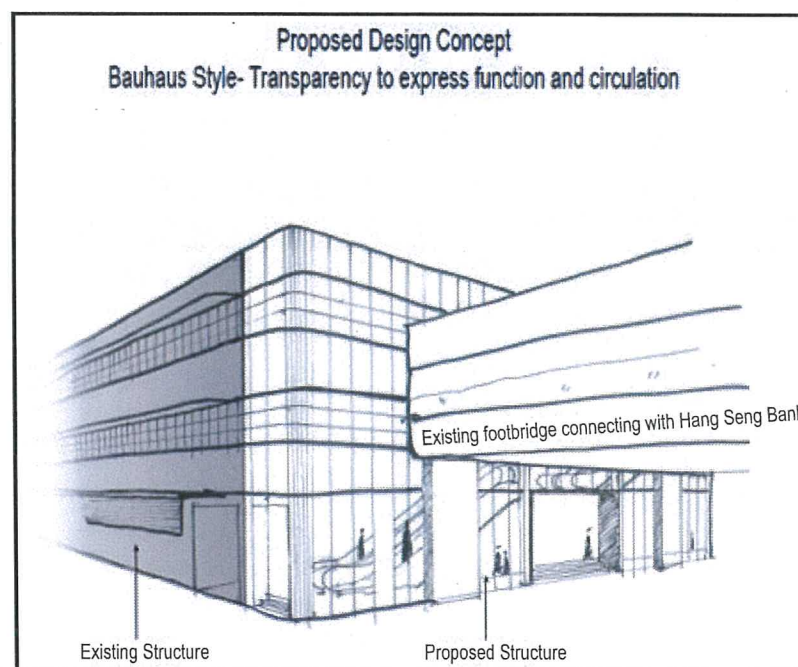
Conceptual Design of the New Facade facing DVRC in planning application (No. A/H4/94)
